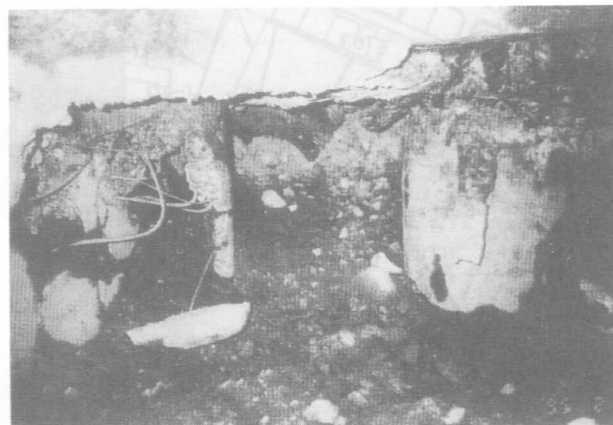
Breakage of foundation pile of the control building (Courtesy of Mr. K. Takenaka)
